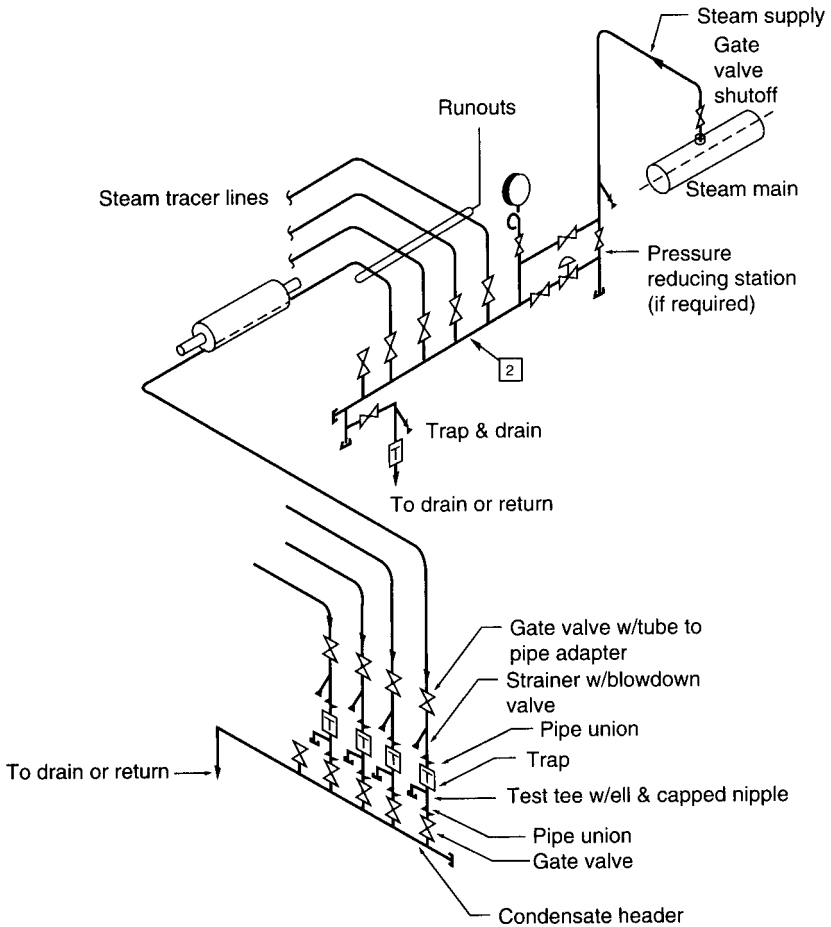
Simplified detail of a typical steam heat tracing system.
